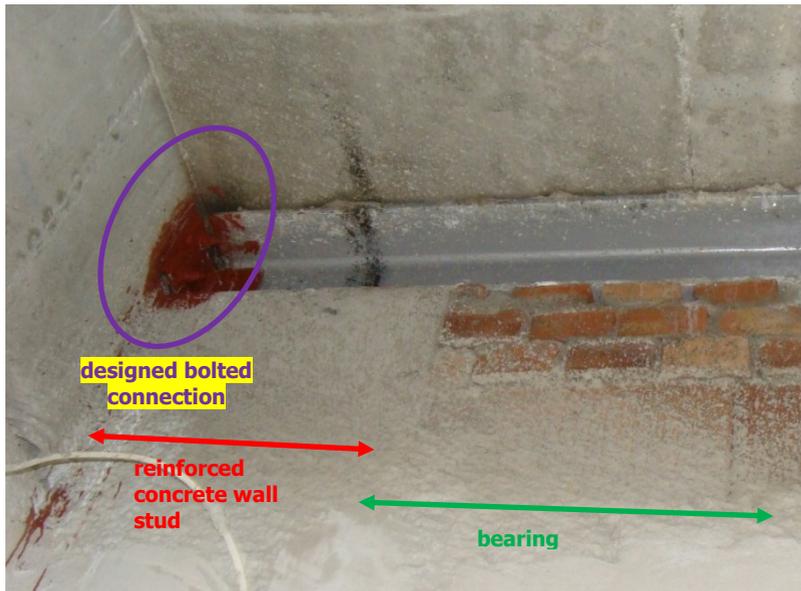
Additional support of the binding joist in the form of a reinforced concrete wall stud
